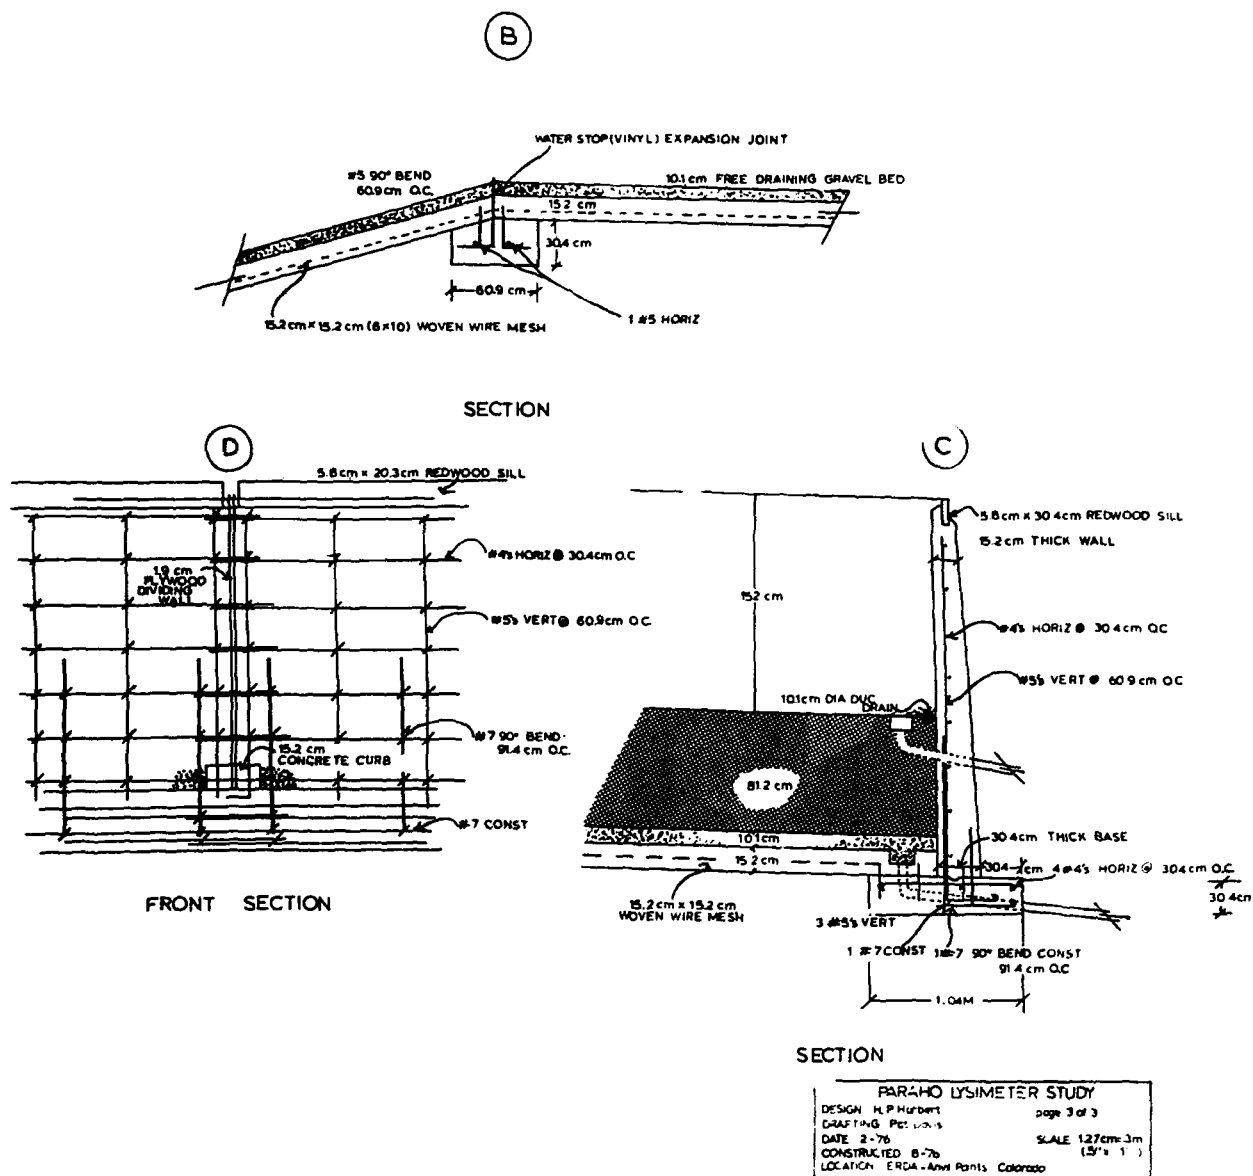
Detailed drawings of the concrete walls, footers, and rebar schedule.
